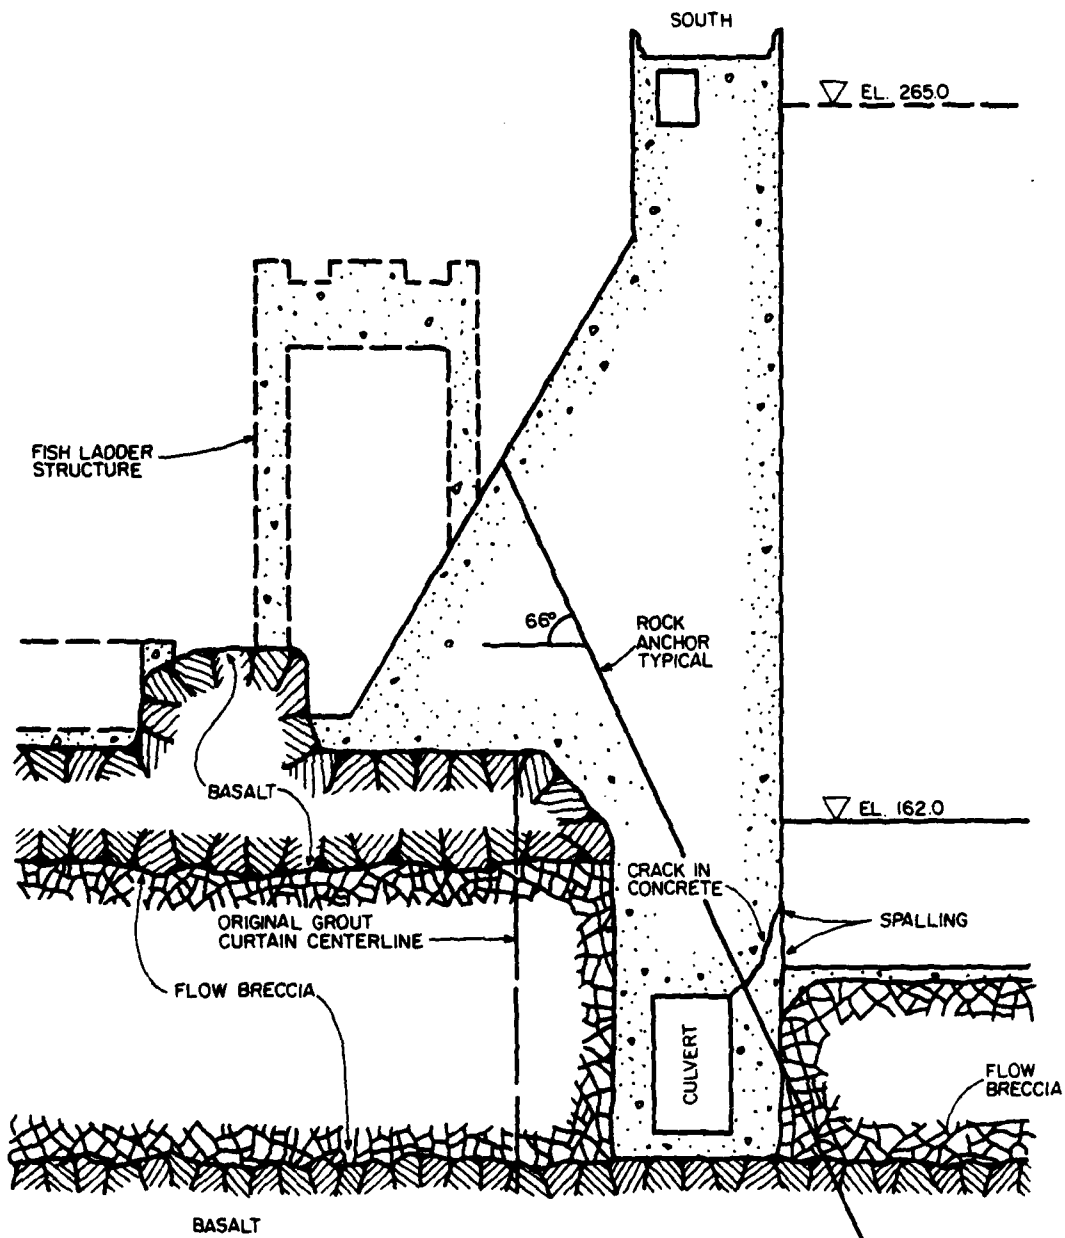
Schematic diagram of John Day Lock and Dam showing cracks in south wall of lock and placement of post-tensioned tendons.
